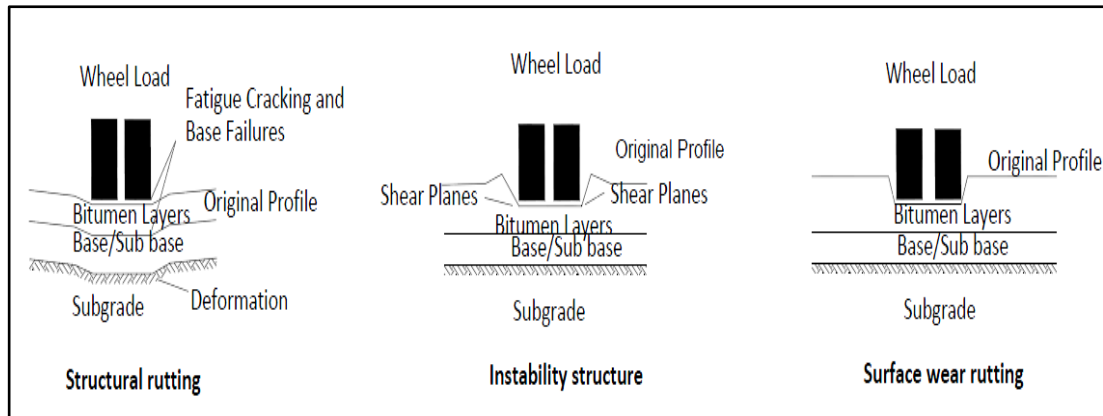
Type of rutting in asphalt pavement (Nguyen and Le, 2016)
